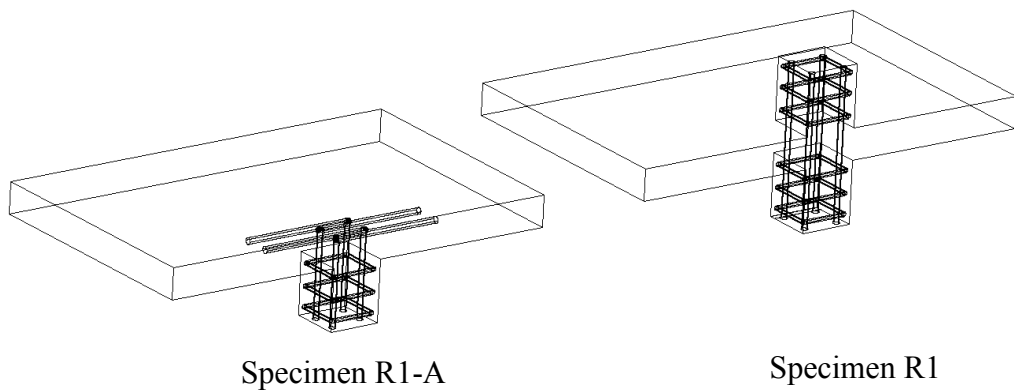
Column stub reinforcement detailing of specimens R1-A and R1
